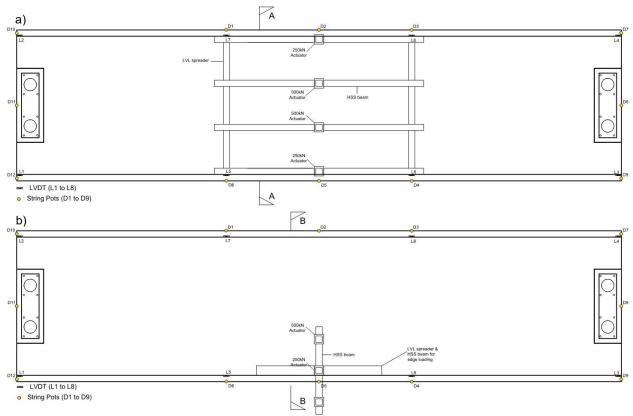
Plan view of full-scale TCC speciemns and location of sensors for: a) 4-point bending test, and b) torsion test
